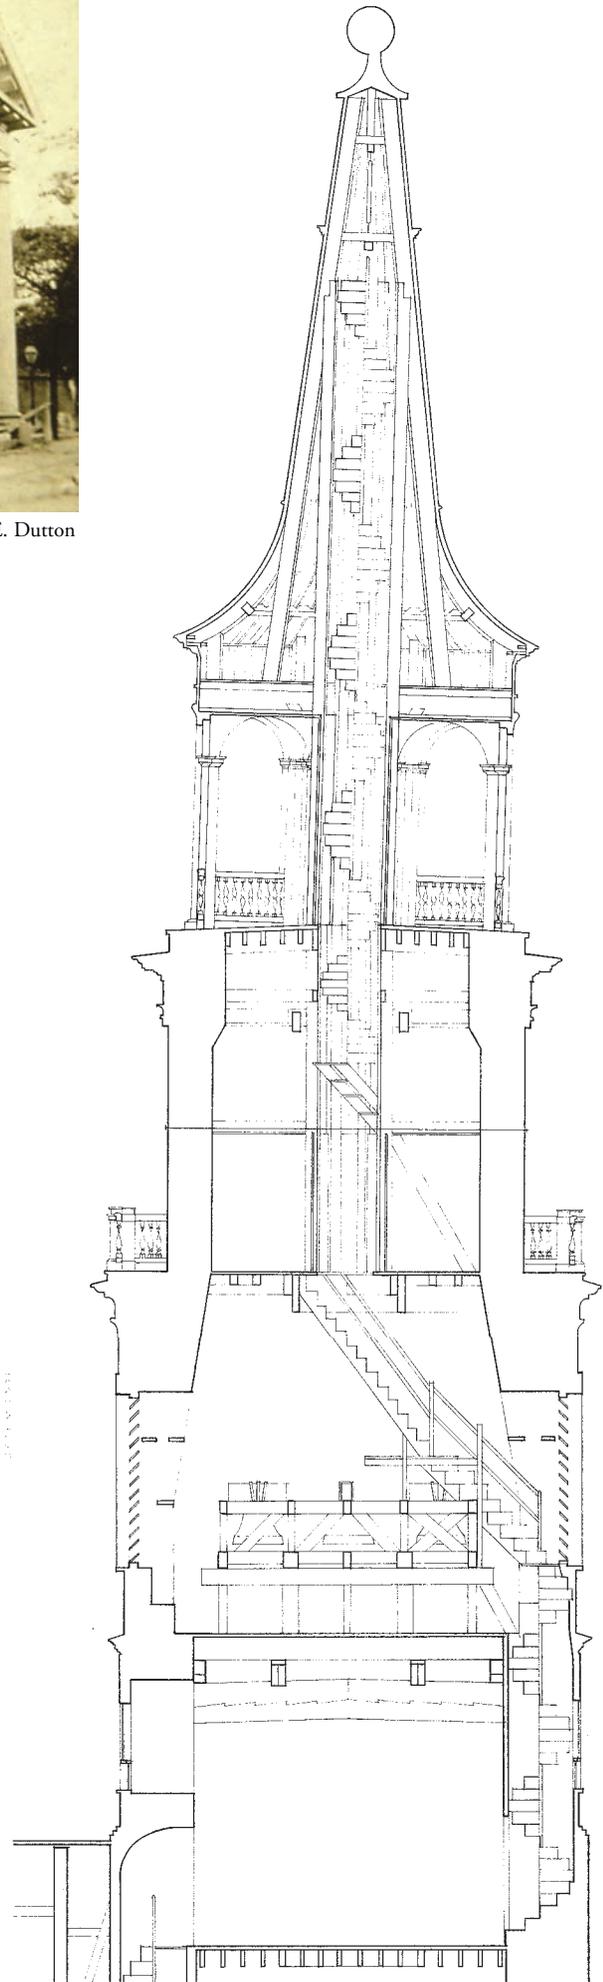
St. Michael's cutaway steeple elevation looking south. Historic American Buildings Survey, 1963, drawn by Mark W. Steele. Spire and lantern shown listing west, toward Meeting Street.
